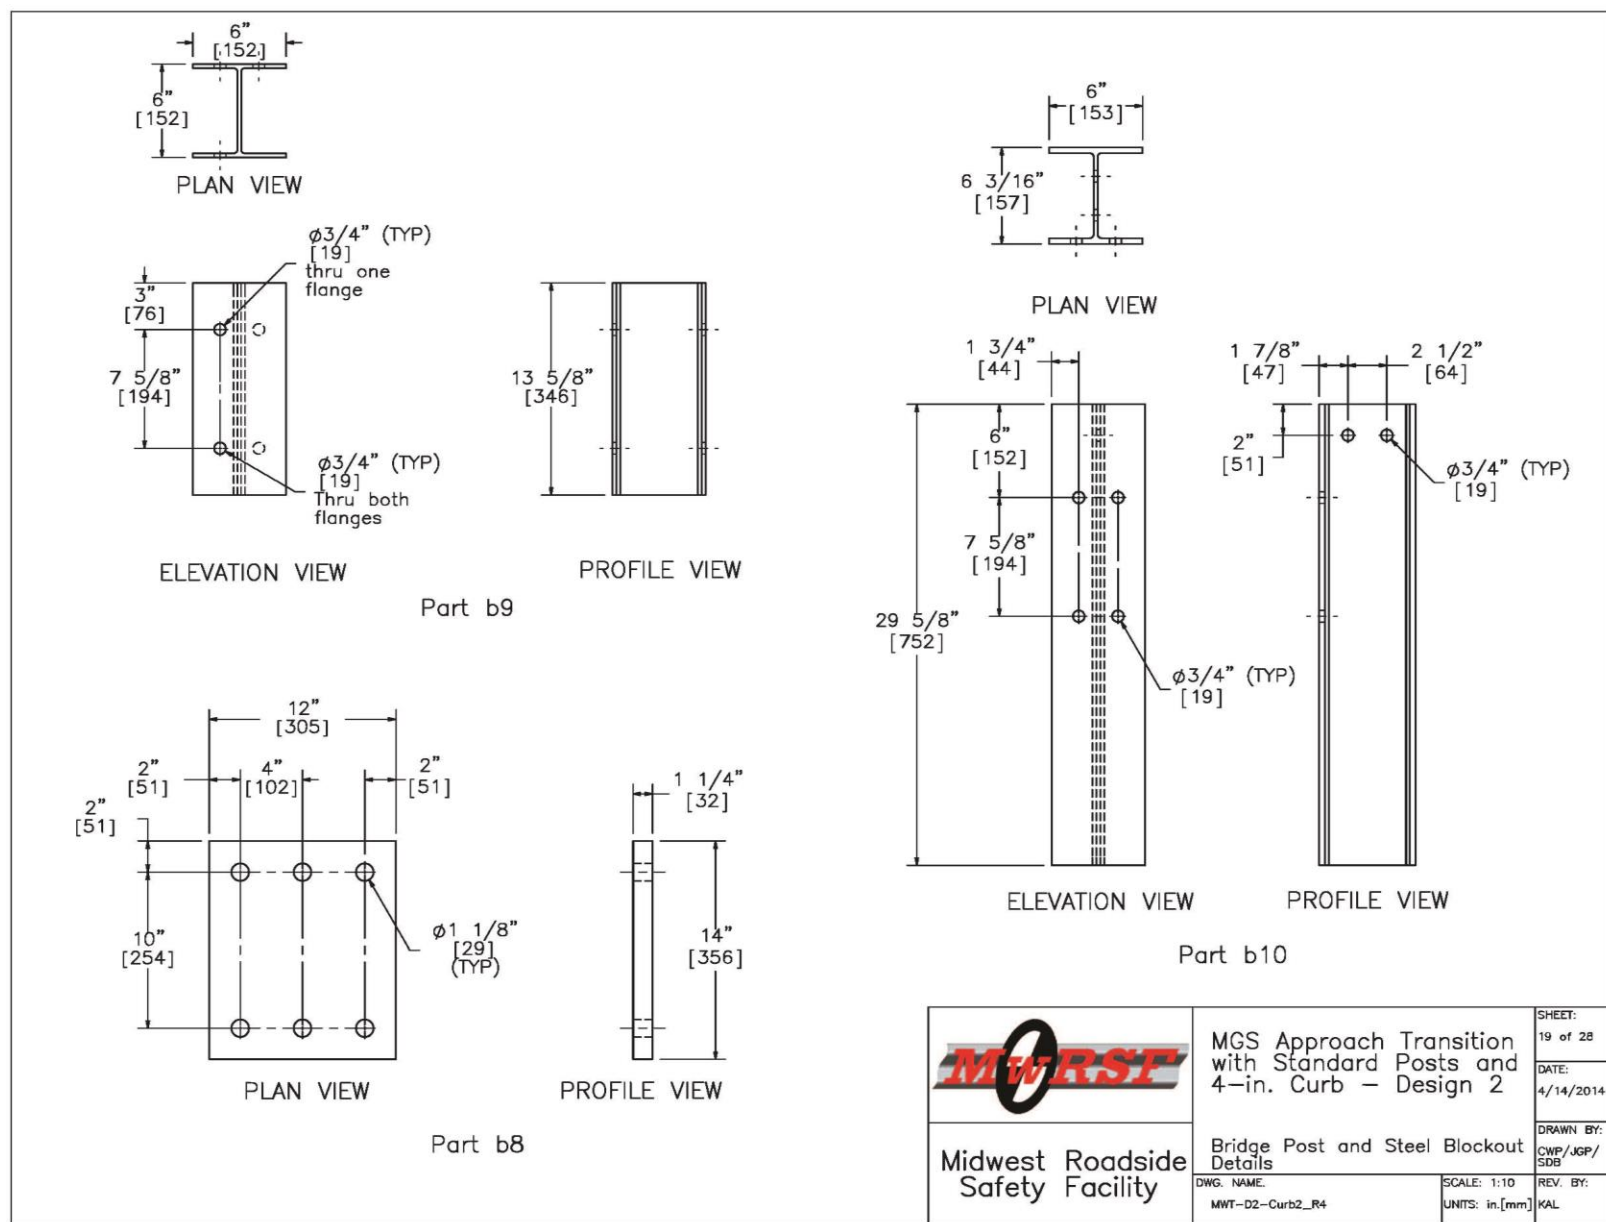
Bridge Post and Steel Blockout Details, Test Nos. MWTC-2 and MWTC-3
